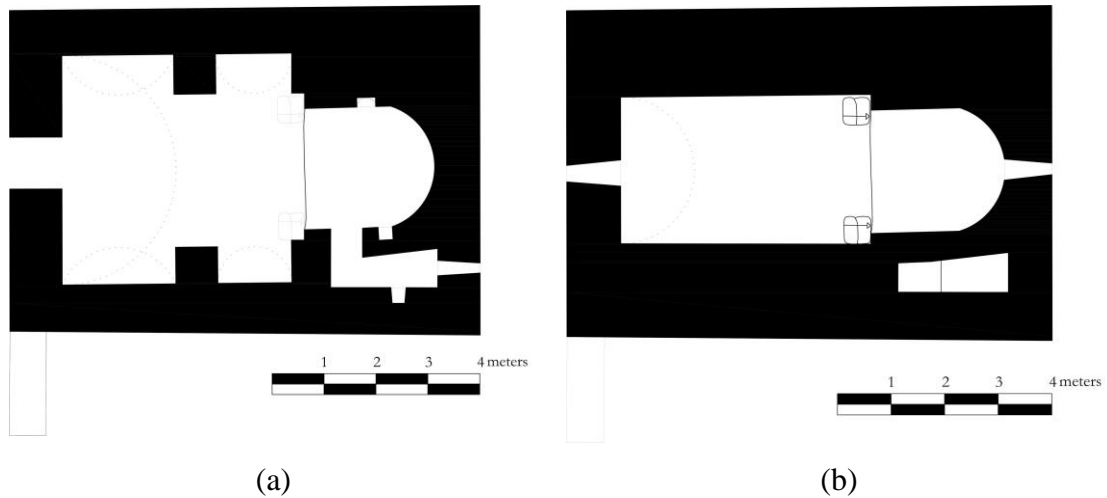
(a) Plan drawing of the church. (b) Plan drawing from upper level of the church.
